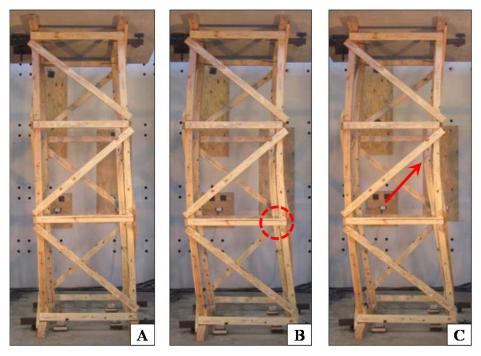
Loading Specimen 6 A) Initial 6in Displacement Prior to Loading B) 1st Connection Failure C) Back Right Post Failure
